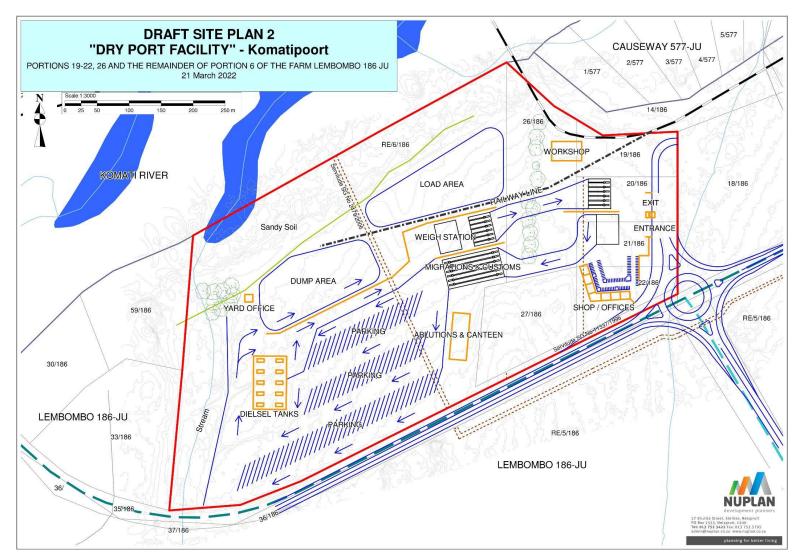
Proposed site plan of the development area ©Ponye Trading and Projects
